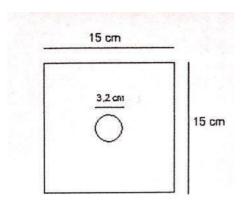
Top view of foundation plate with reinforced single column of 3.2 cm diameter.
